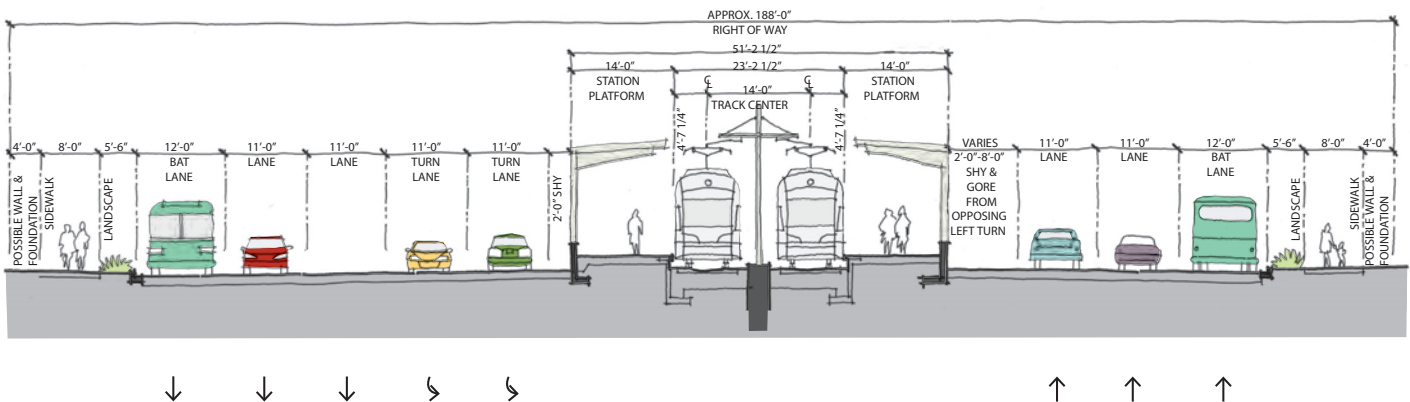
Level 2 L2: SR 99 Mixed Profile Light Rail Alternative Detail - 4 of 4
